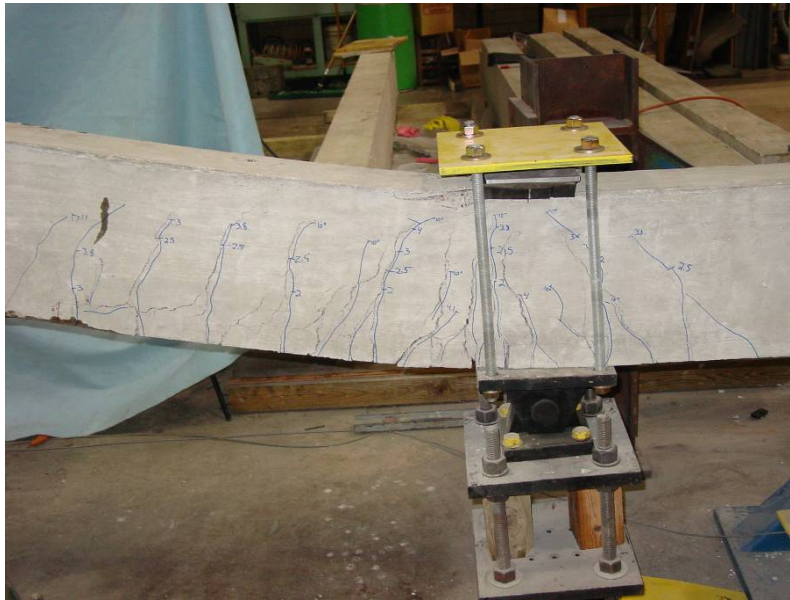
Fracture of threaded rod at 32 k axial tension
